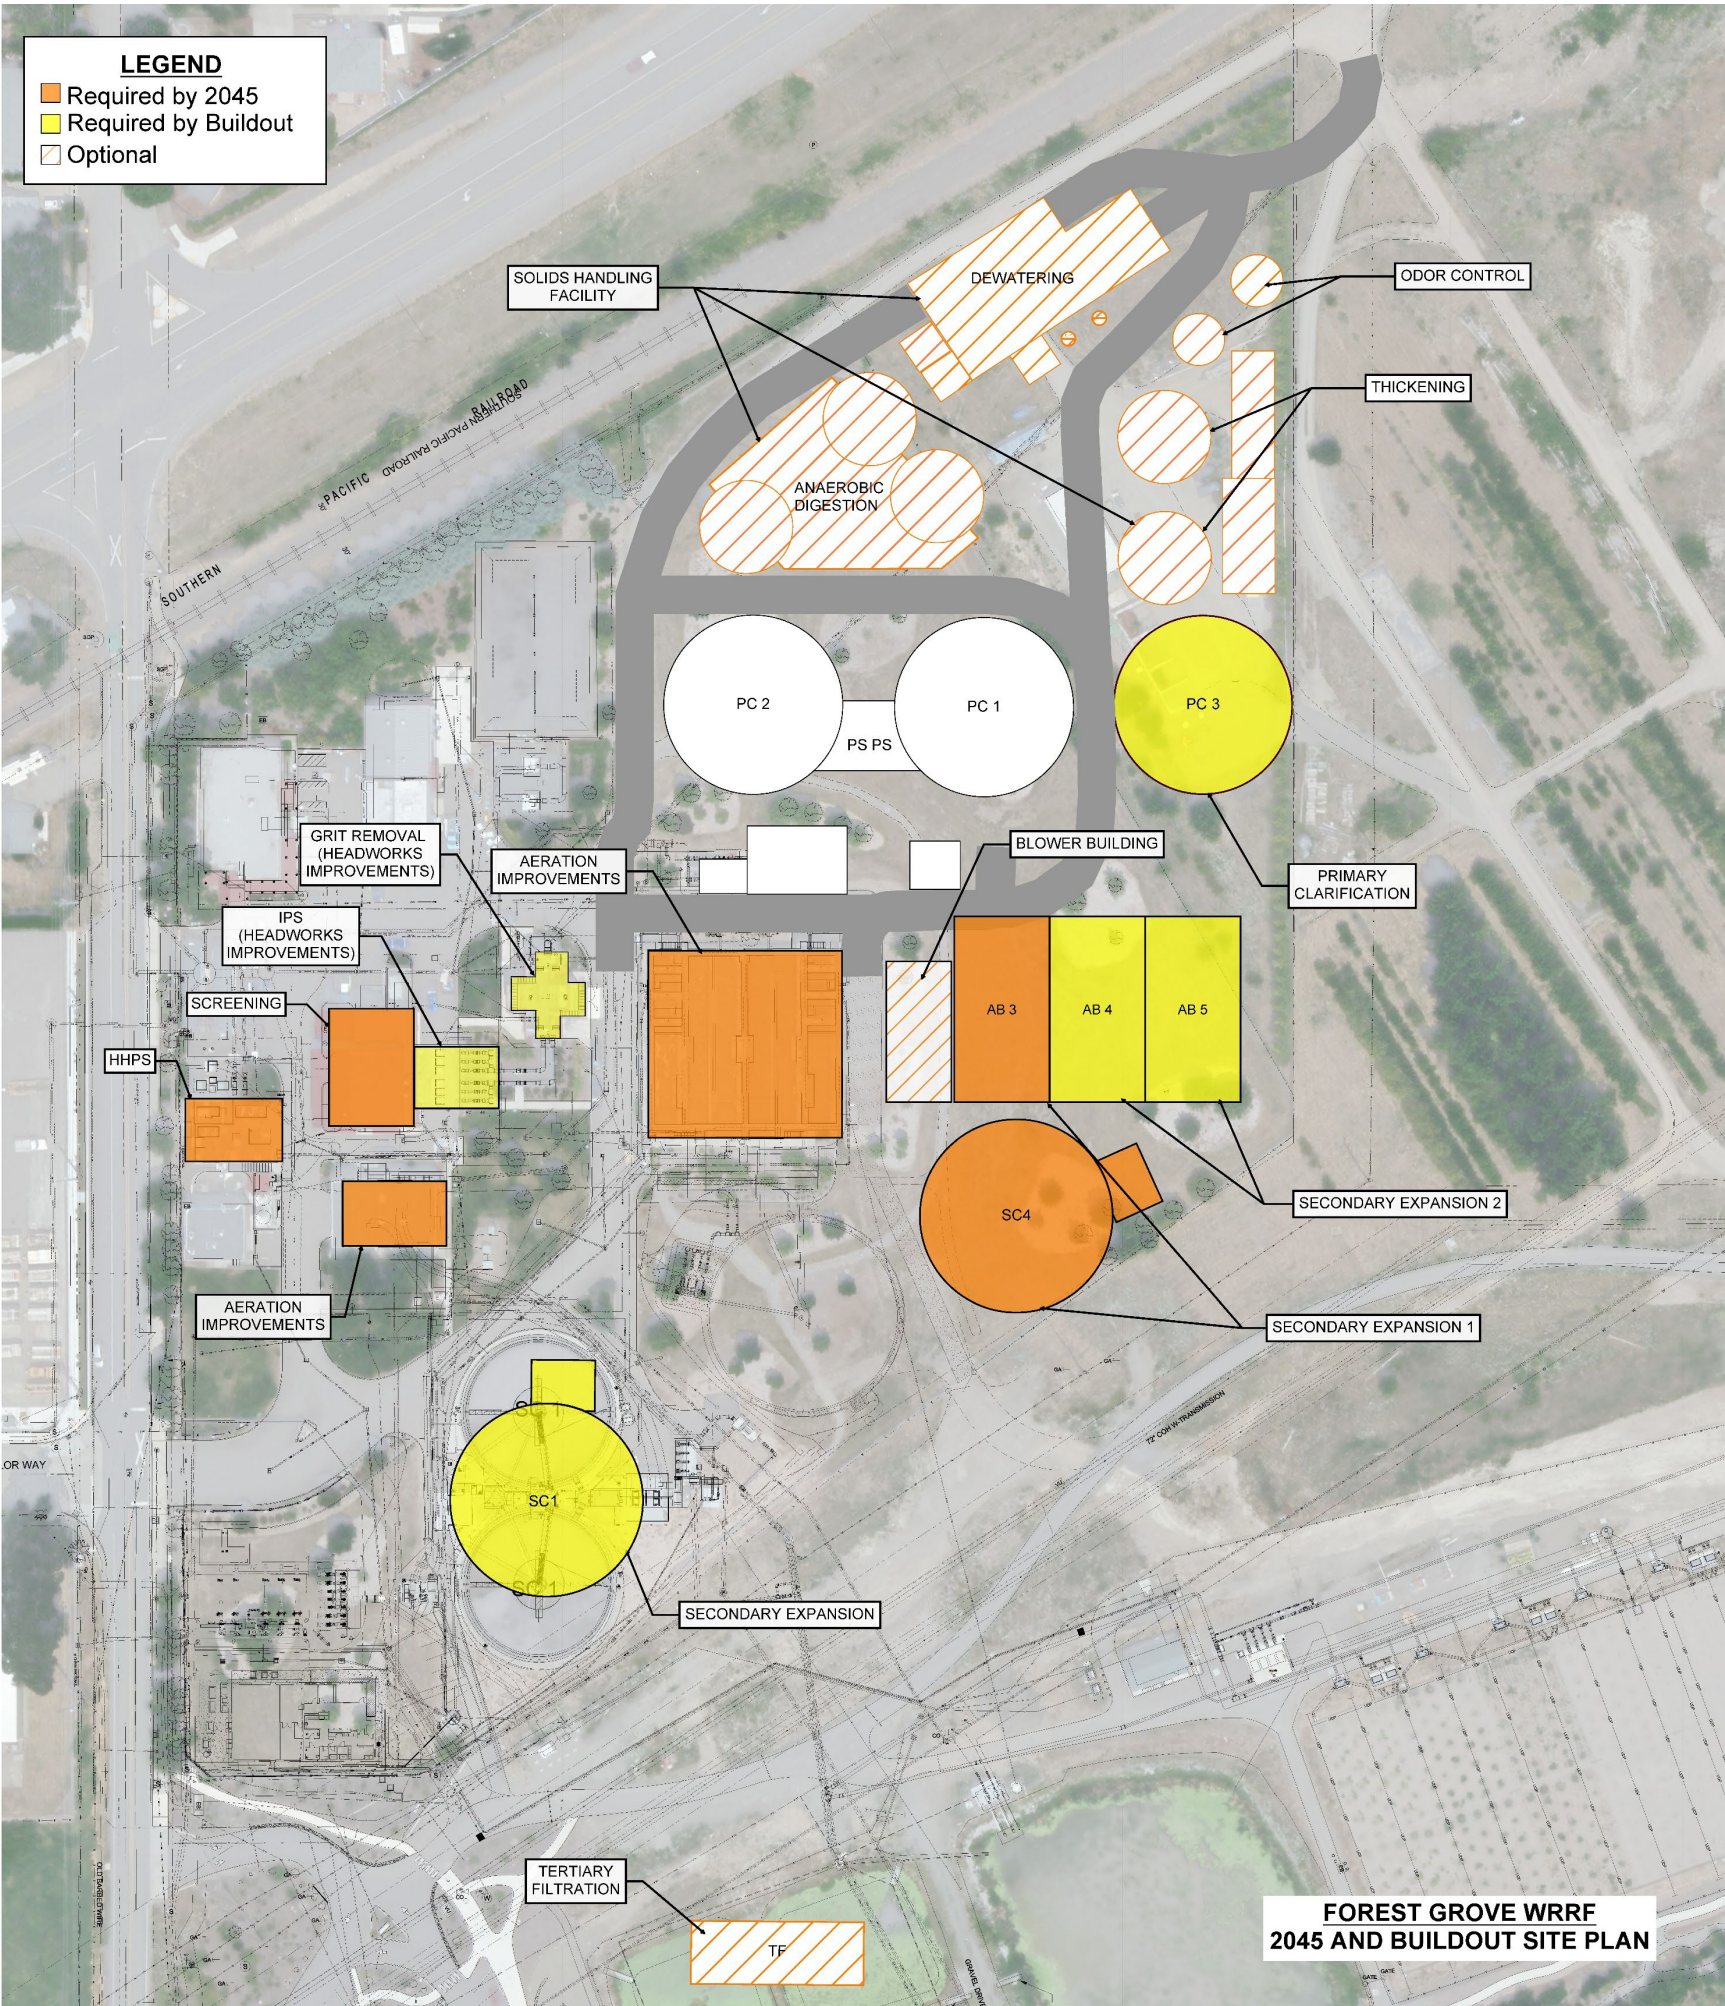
Forest Grove WRRF Recommended 2045 and Buildout Site Plan
